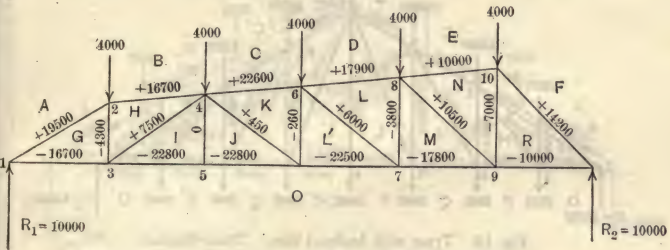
Howe Truss with Slanting Top Chord. Truss-diagram
